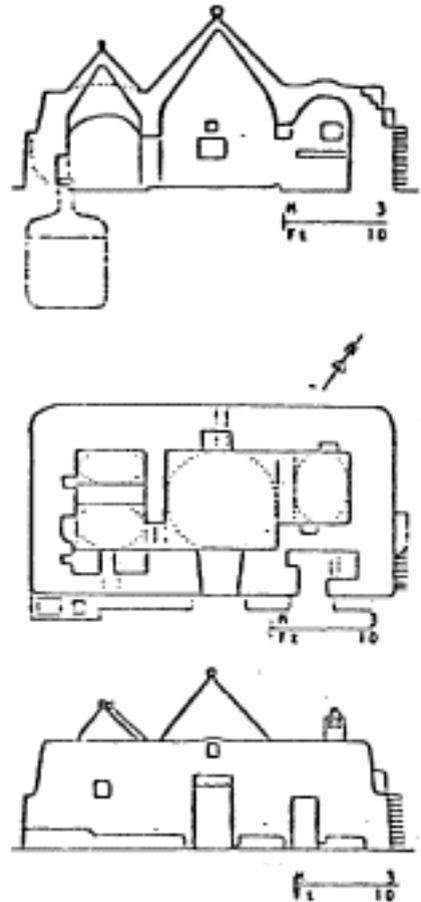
Longitudinal cross section, plan and south elevation of the "Trullo" studied.
